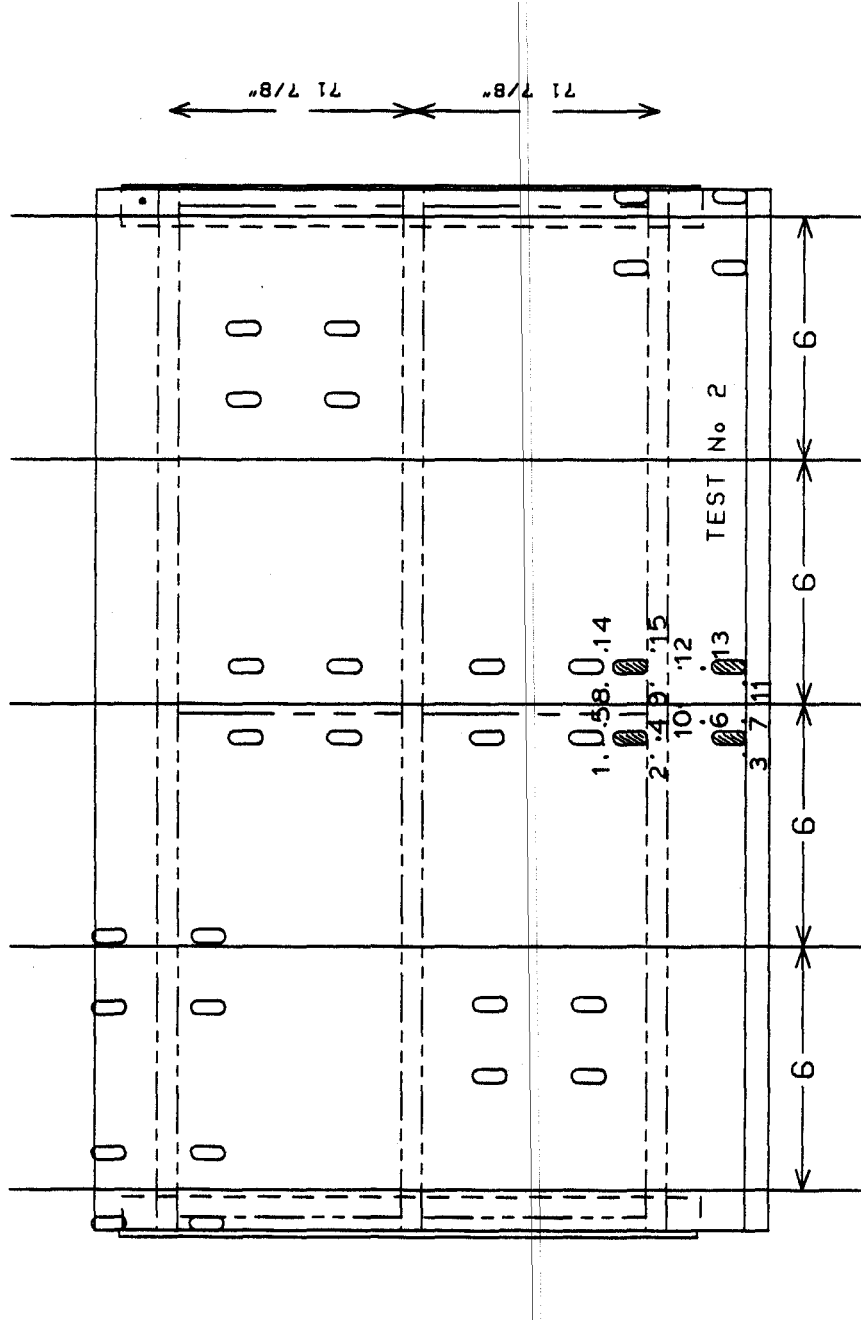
LVDT Locations (Third Bridge - Test No. 2)
